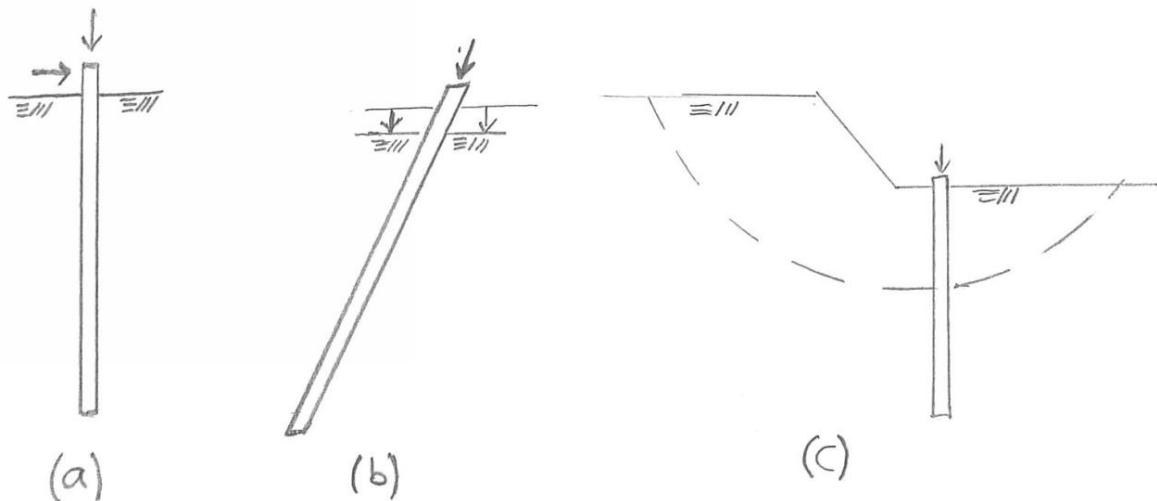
Typical load cases where a transversal and axial load is acting on a pile.
